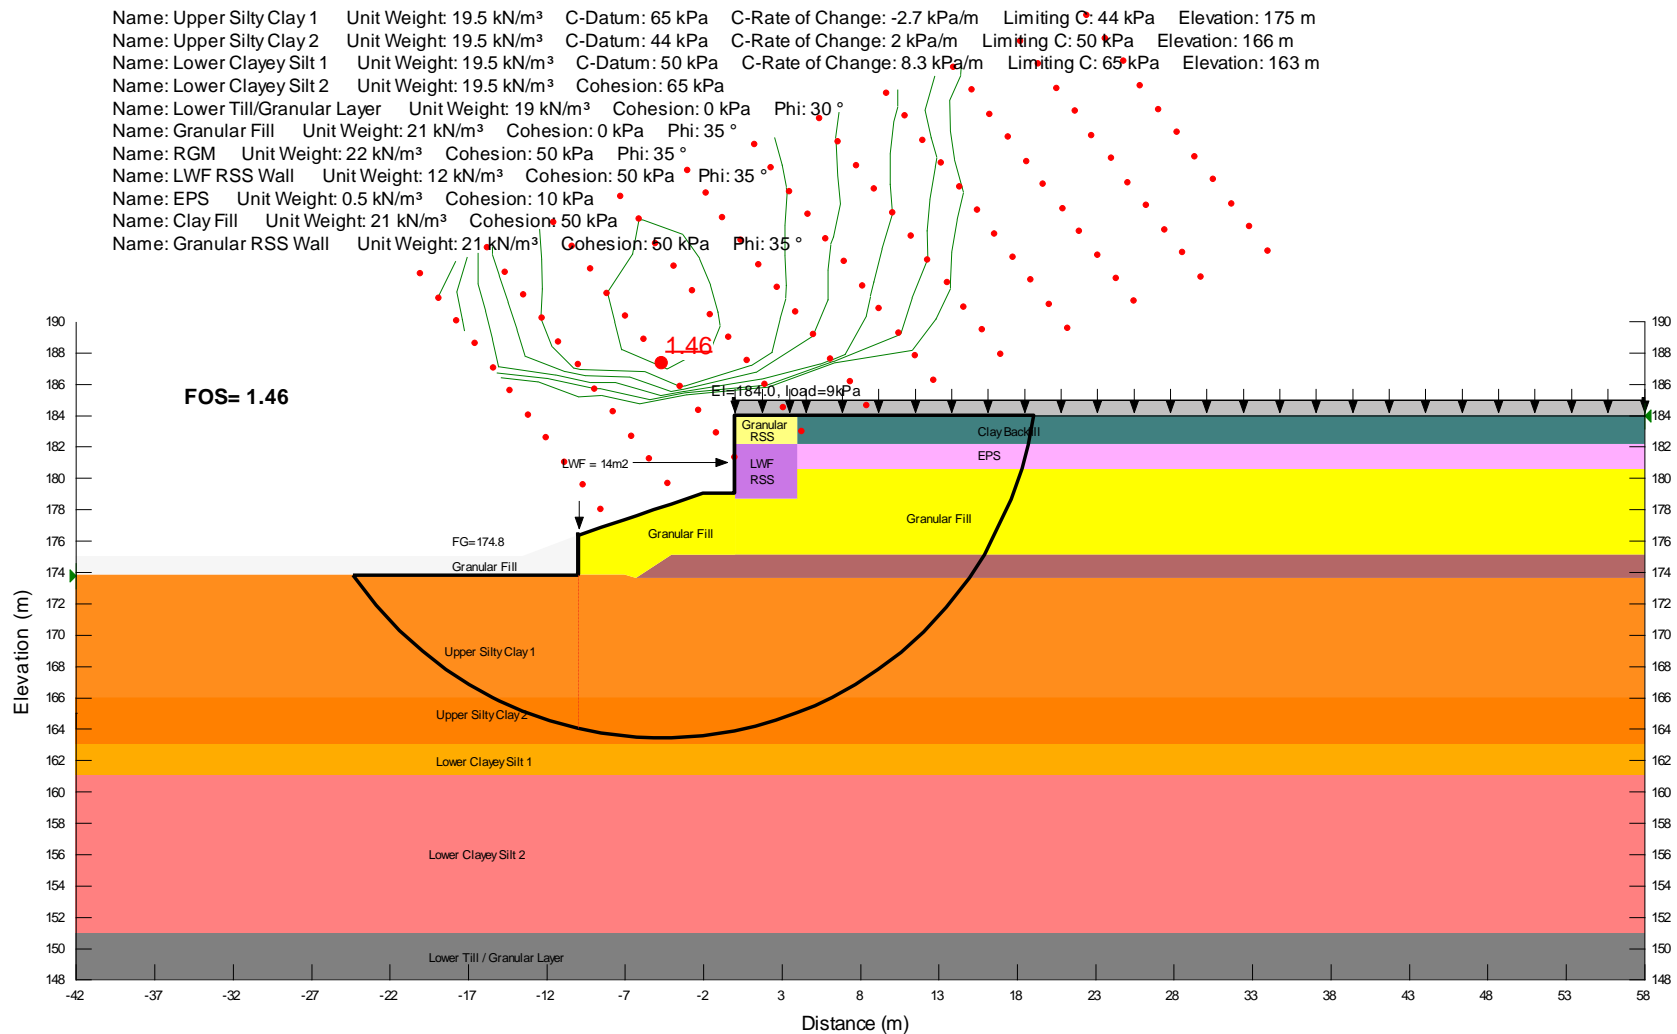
Slope Stability – Short Term – South Abutment – Return Wall – Station 10+450L Hwy 401
